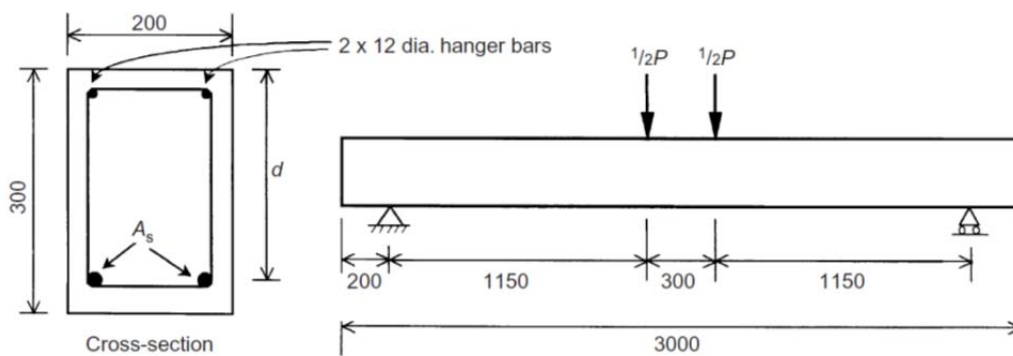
Cross Section details and loading arrangement (Pam et al., [41])
